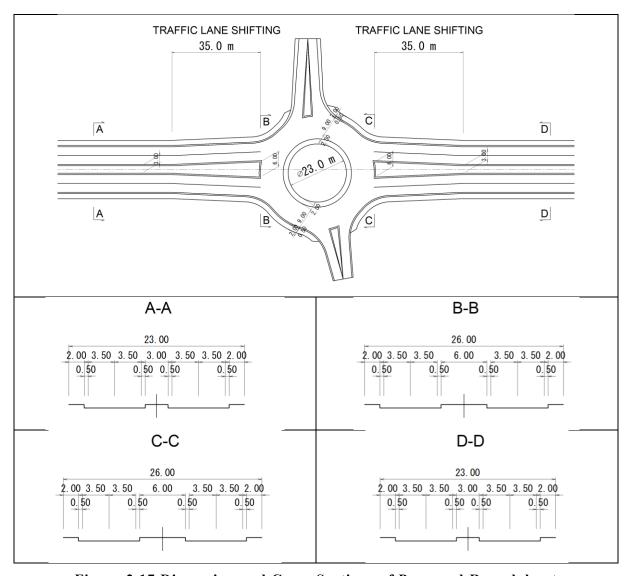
Dimension and Cross Sections of Proposed Roundabout
